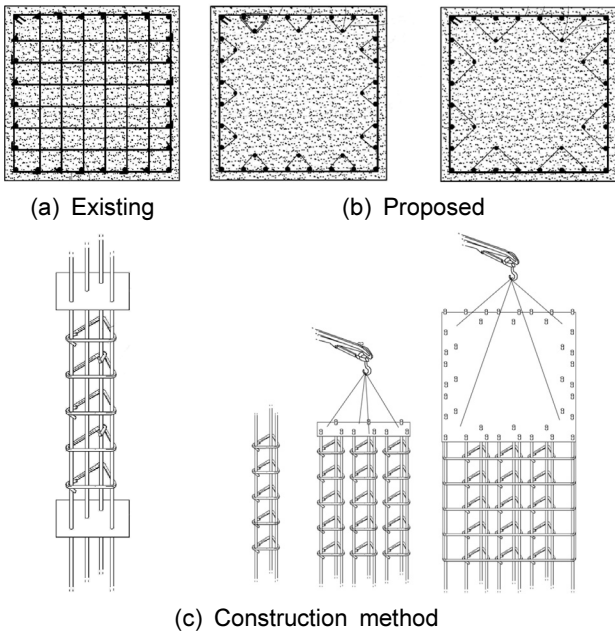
Solid reinforced concrete columns with triangular reinforcement details
